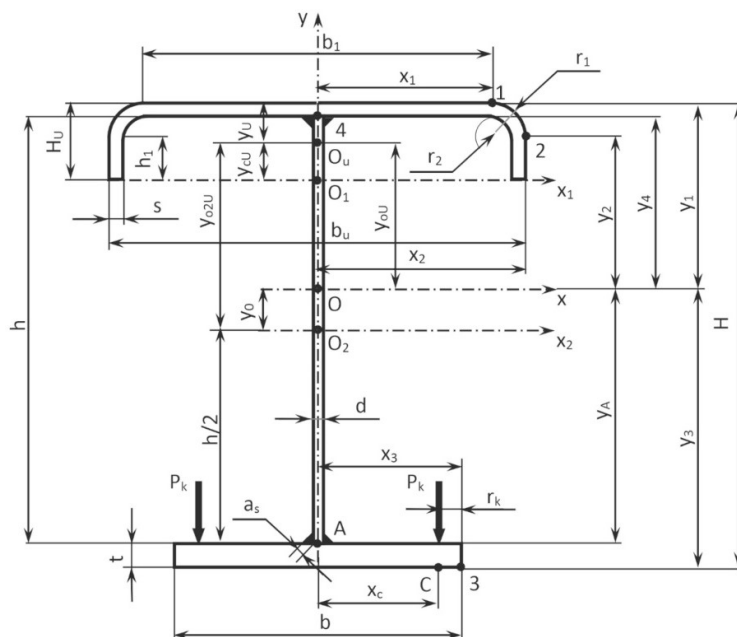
Cross-section of the main girder of the single-beam bridge crane
